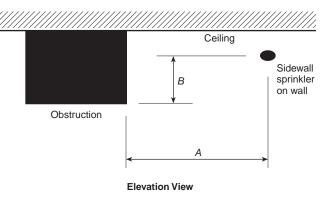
(b) Positioning of Sprinkler to Avoid Obstruction Along Wall (Residential Sidewall Sprinklers).
